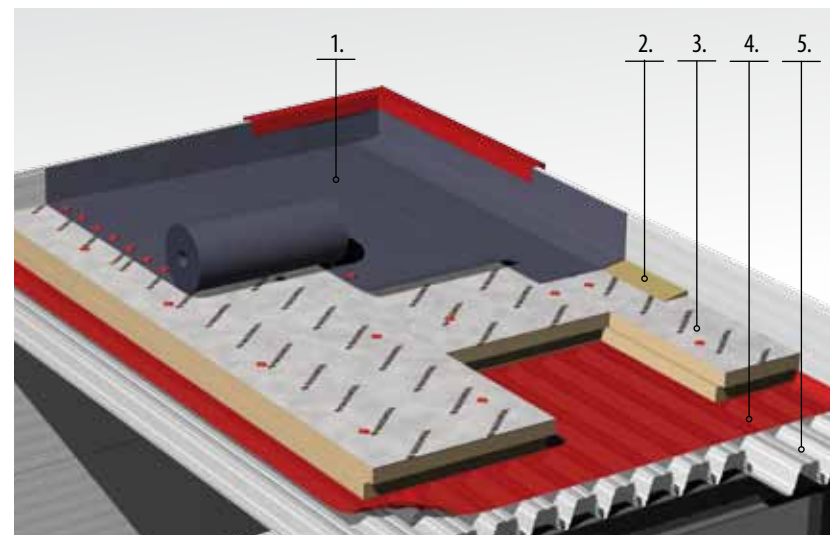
LAYERS ON A FLAT ROOF
